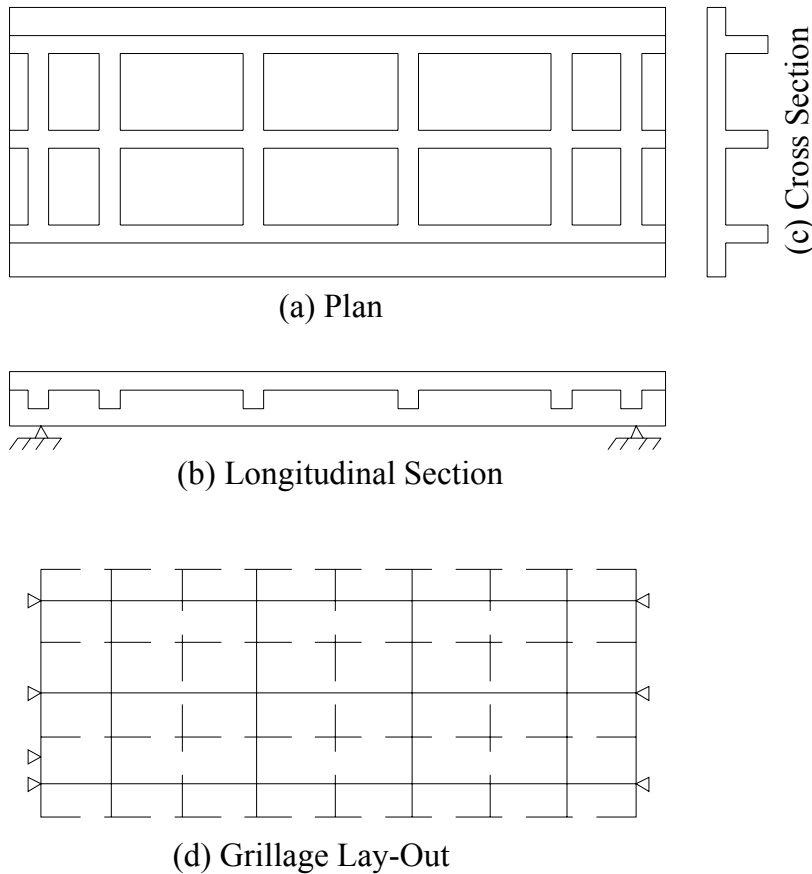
T-Girder Bridge and Grillage Lay-out
